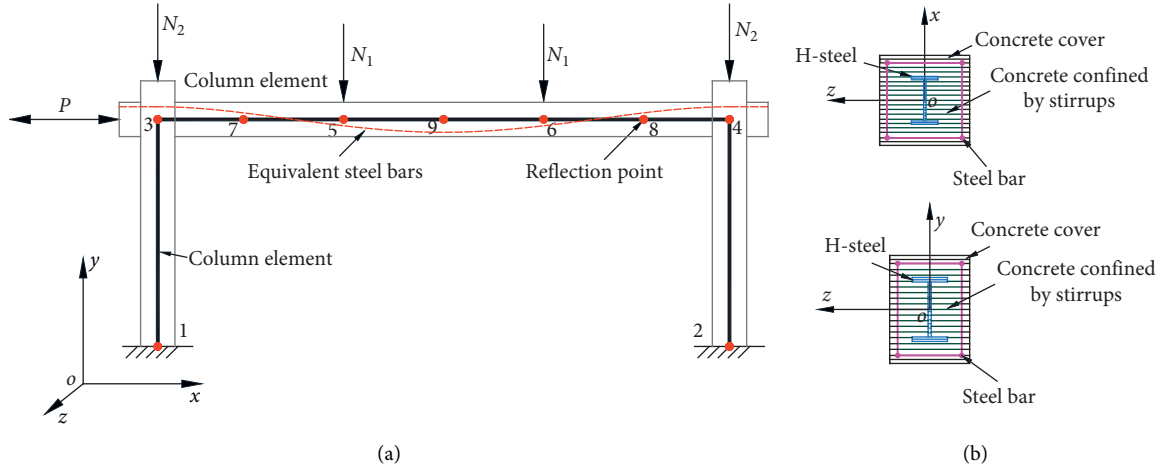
Node layout and element section division. (a) Node distribution. (b) Division of cross section.
